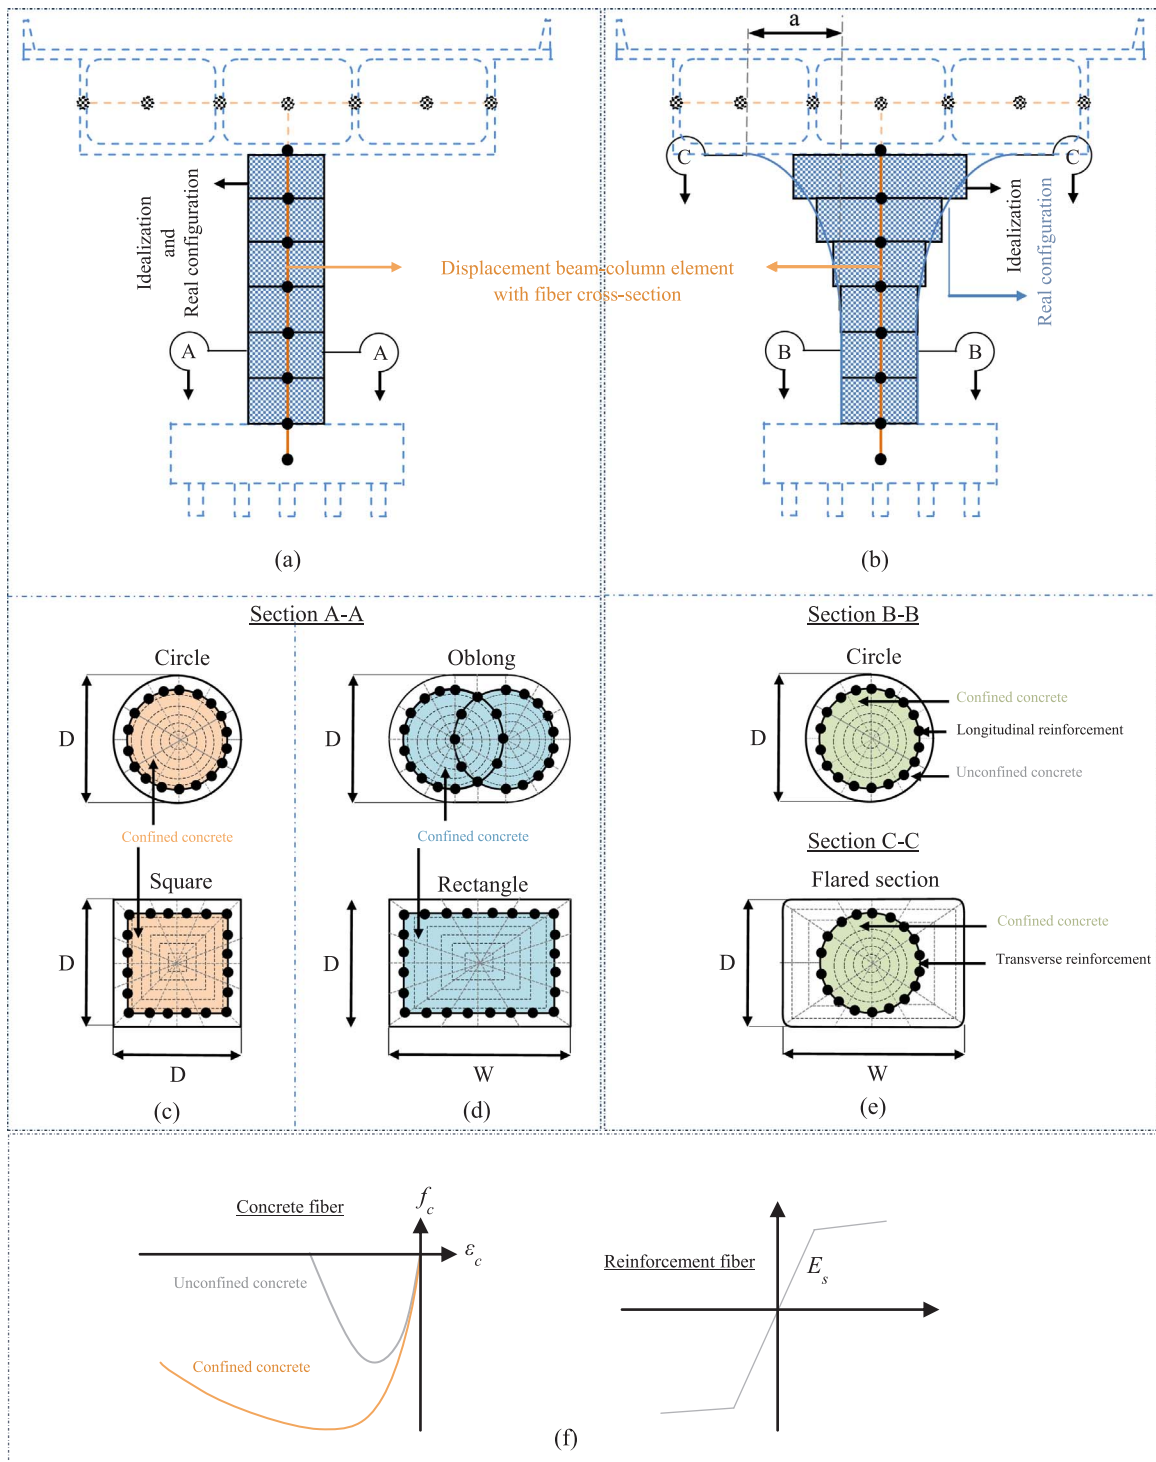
Column configurations in box-girder bridges for: (a) Prismatic columns, (b) Flared columns, (c) Type I cross-section shapes, (d) Type II cross-section shapes, (e) Type III cross-section shapes, (f) OpenSees material objects assigned to the fiber cross-section.
